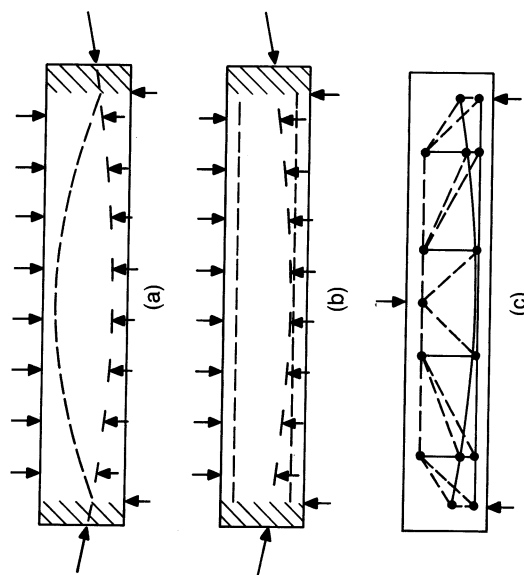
Models 1 and 2 for prestressed beams: (a) model 1 with arch action; (b) model 1 without arch action; (c) model 2
